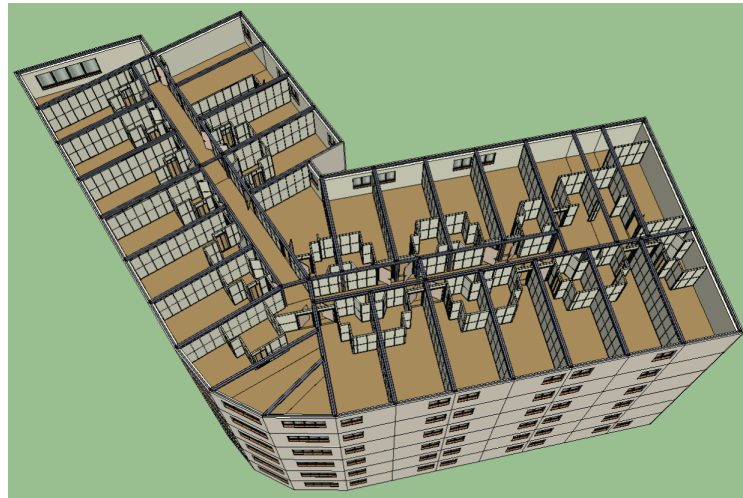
Building plan and 3D model generated by the BIM: Perspective view
